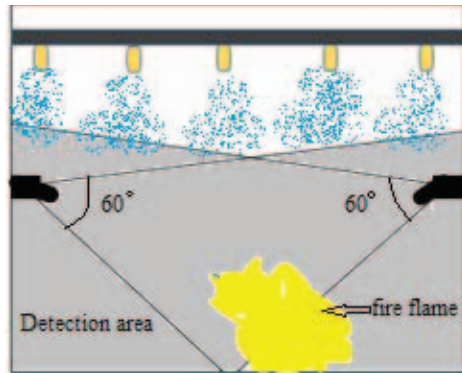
Side view of the installed sensors based sprinkler system in the hall
